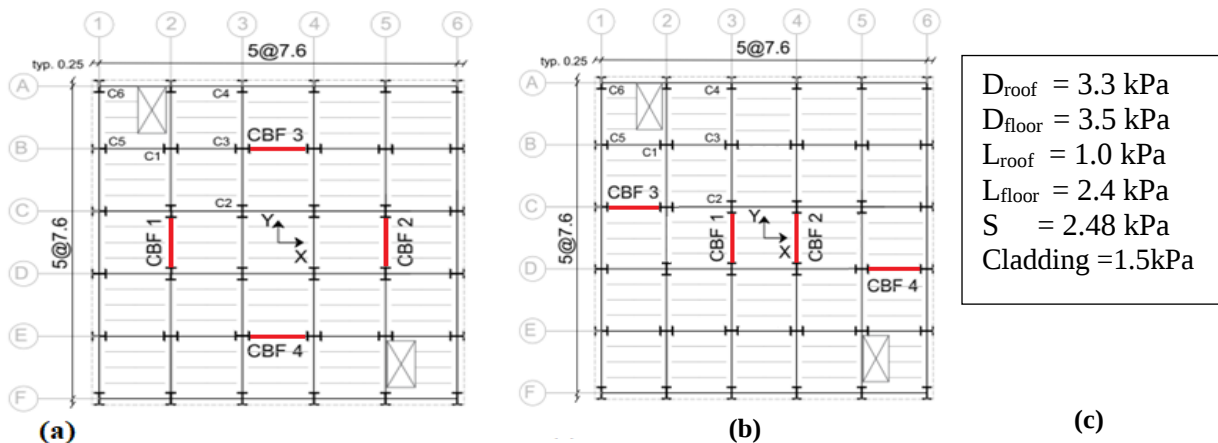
Building plan and design loads: a) B #1, b) B #2, c) loads.
